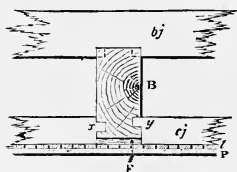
Ceiling Joists Chase-mortised into Binder.
